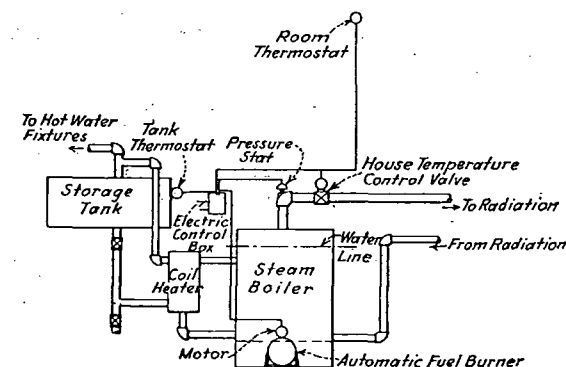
TYPICAL ARRANGEMENT OF STEAM OR VAPOR SYSTEM WITH TWO THERMOSTATS CONTROLLING AUTOMATIC FUEL BURNER USED FOR HOUSE HEATING AND WATER HEATING
